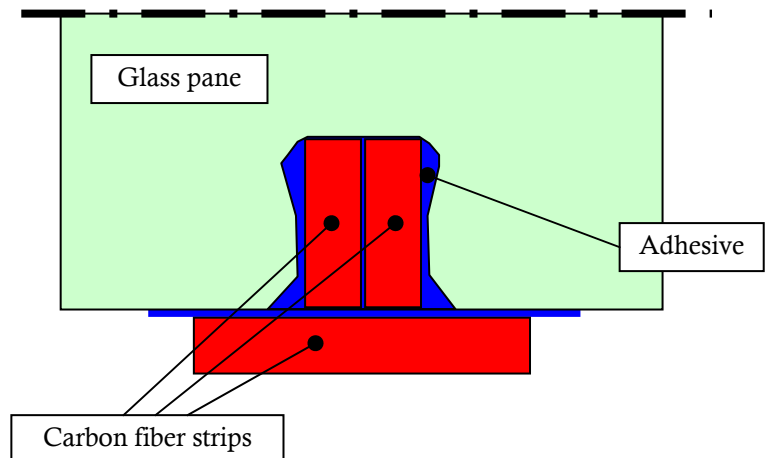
, Close-up of bottom of girder cross-section with reinforcement geometry for specimen 2.
